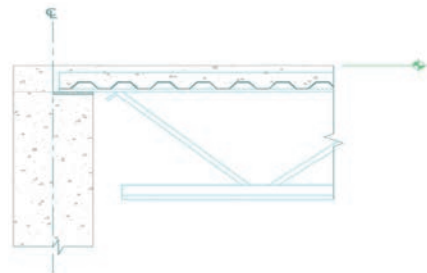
Typical Vescom Joist to Concrete Wall Connection
